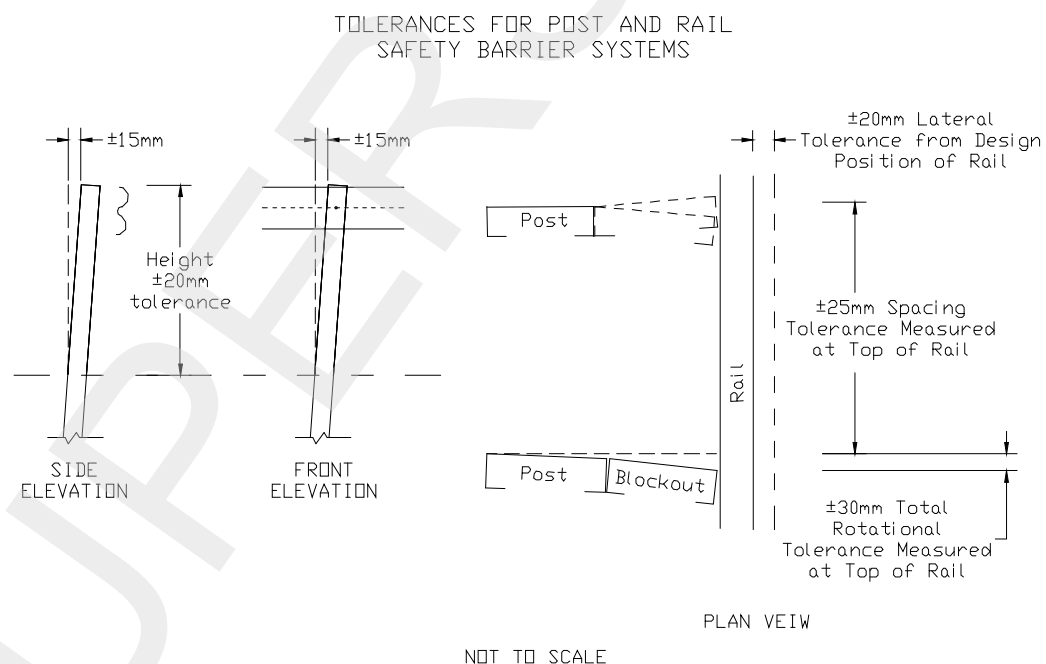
Tolerances for post rail safety barrier systems
